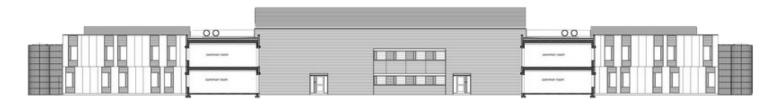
BUILDING B - RESIDENTIAL UNIT - EAST ELEVATION
